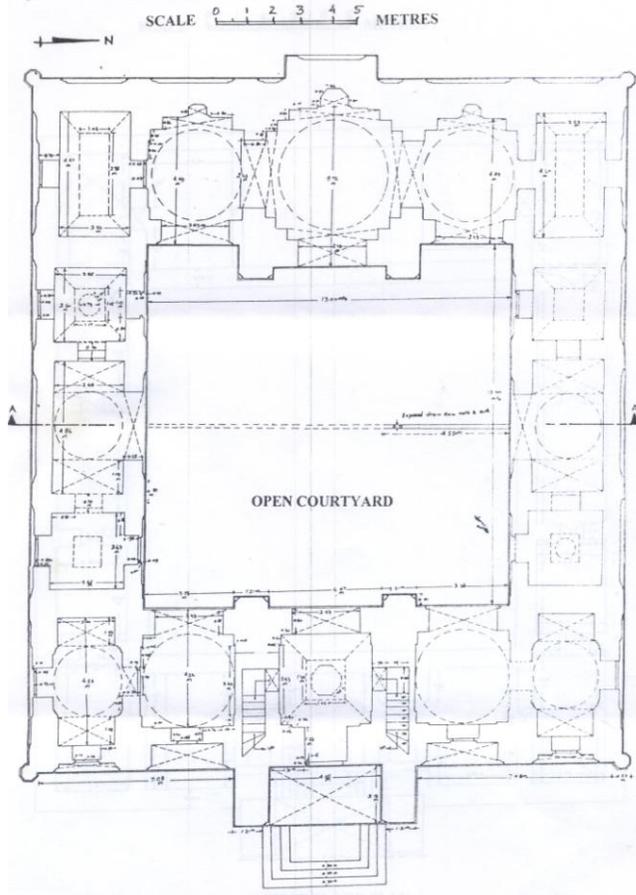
Mullah Shah Mosque Plans: Schematic and Dimensioned Plans
